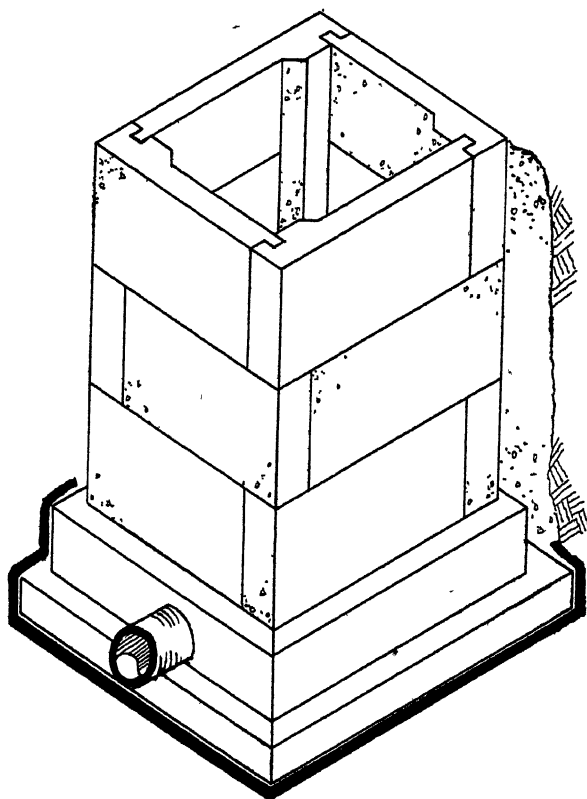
CONCRETE SLAB MANHOLE CHAMBER.
